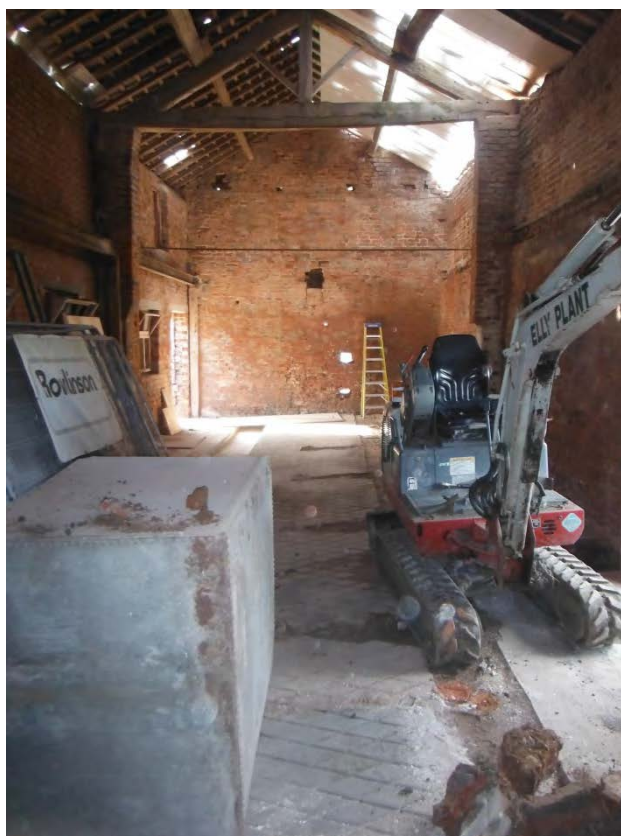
Concrete floor within room G1 of Block B prior to removal, looking south-west.
